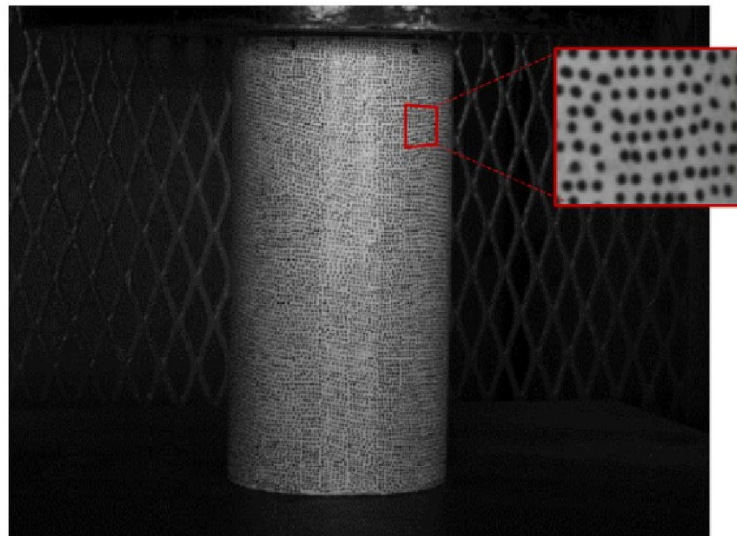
the test setting of a DIC test above [32]; an example of sprayed surface below [29];
